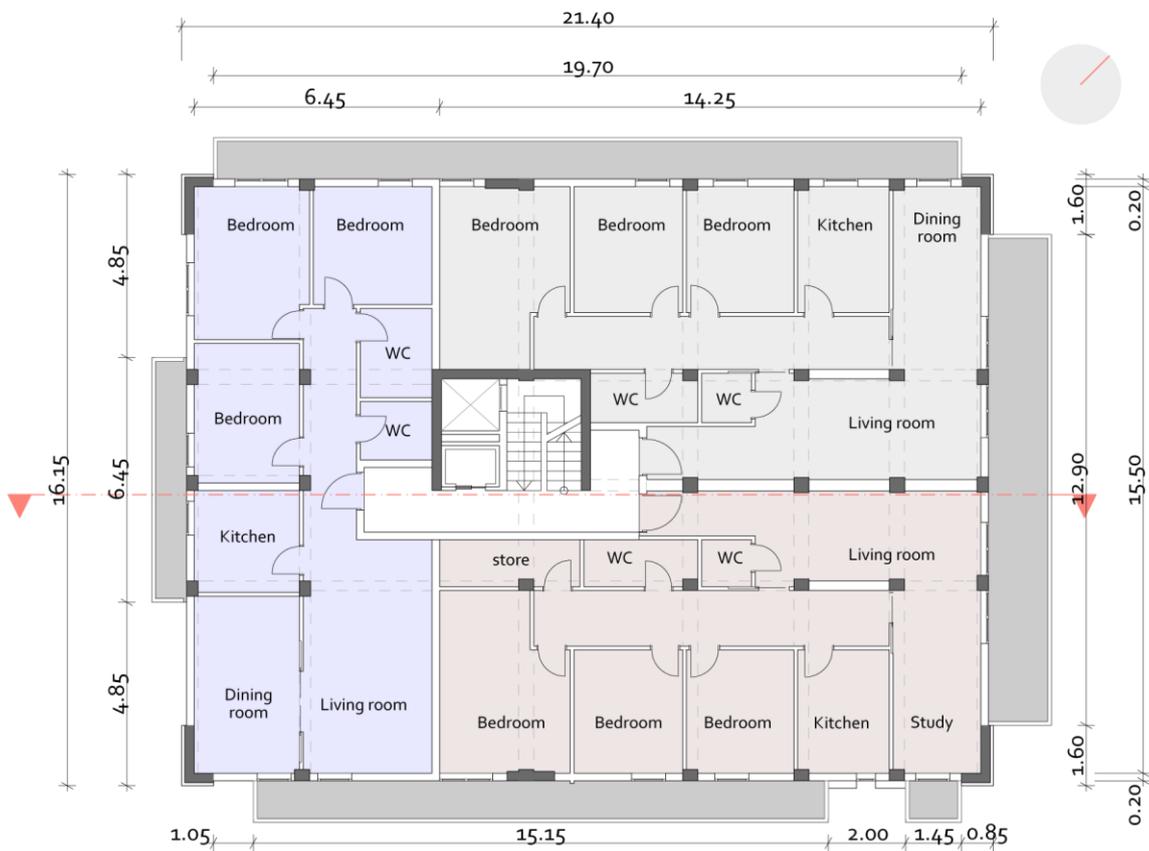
Typical Floor plan (1st, 4th and 5th floor) of building MF2
